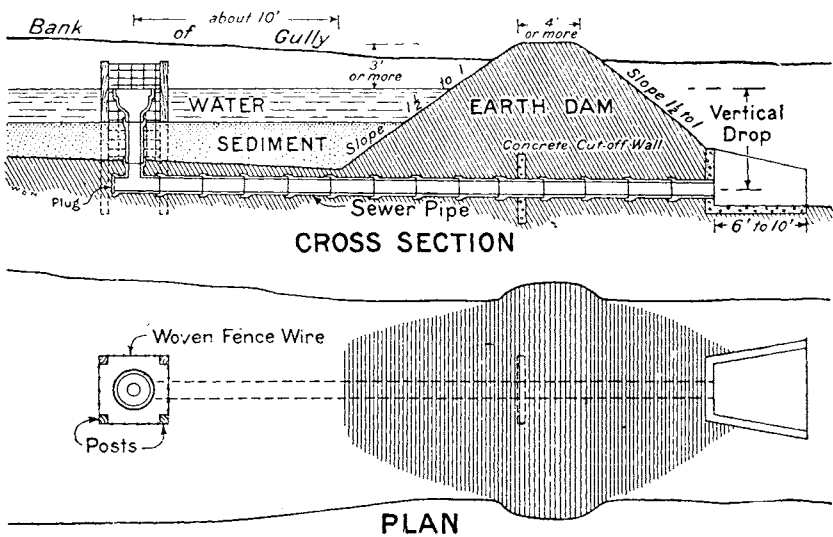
Plan of an earth dam from Farmers' Bulletin No. 1234
